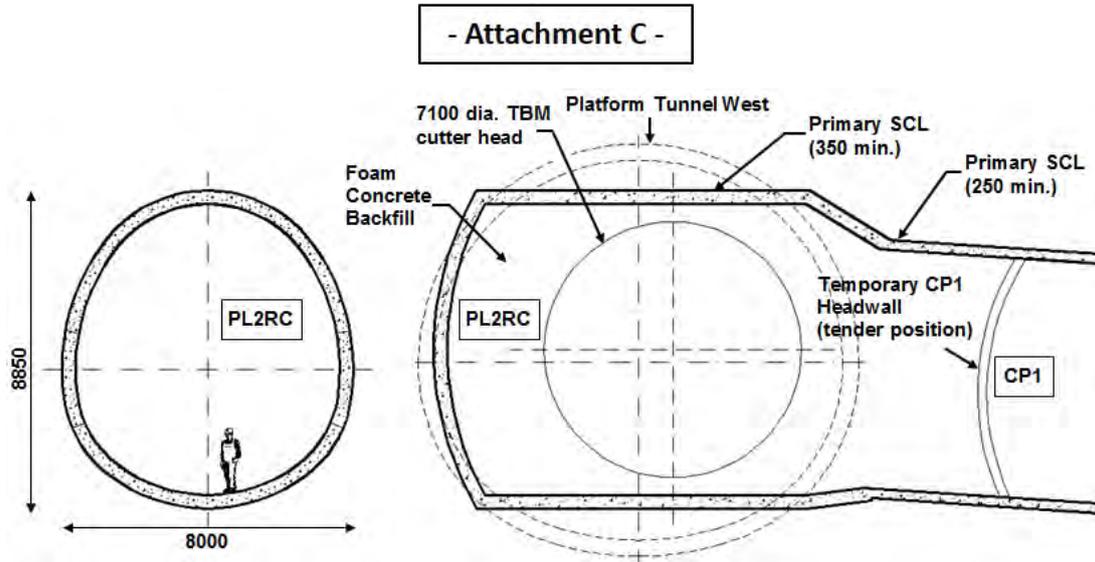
Details from PL2RC construction drawings, showing the cross section (left) and the longitudinal section (right).
